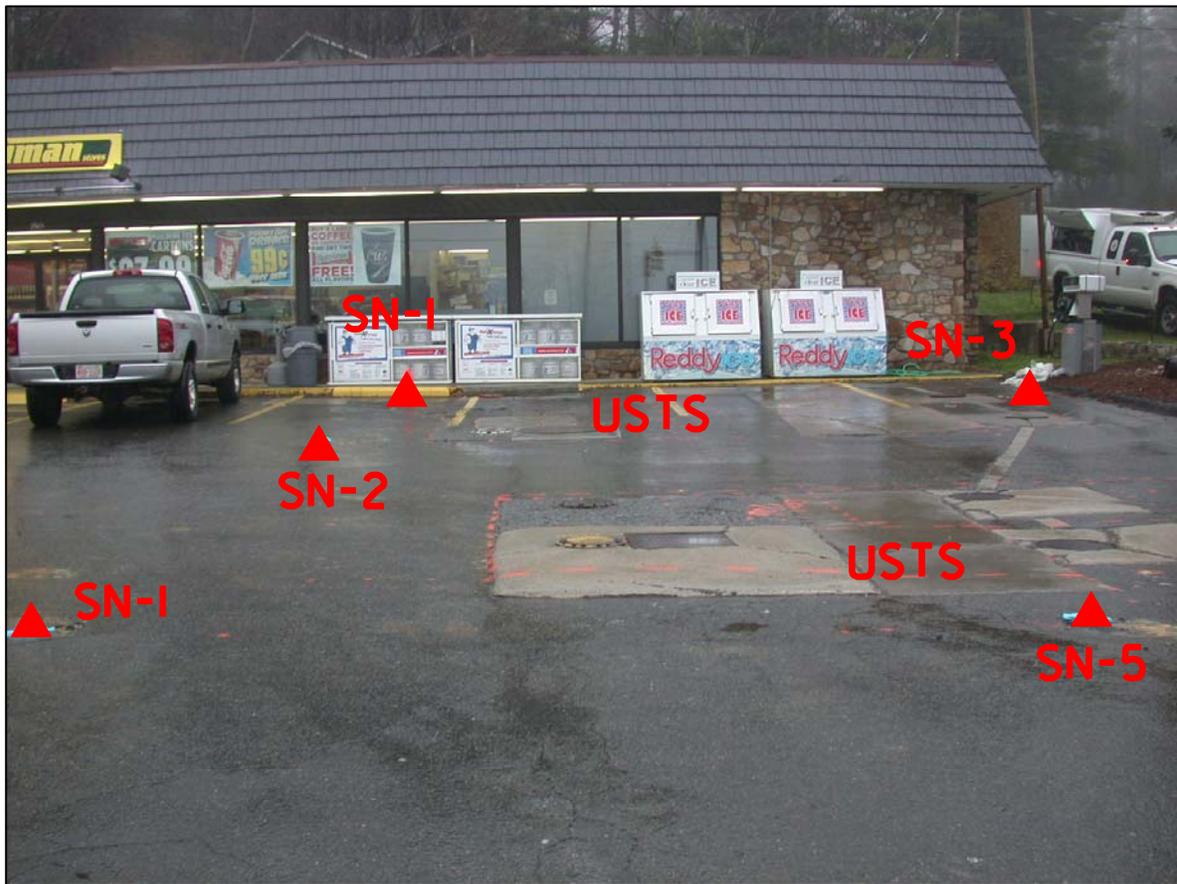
BORINGS AT USTS LOOKING EAST
